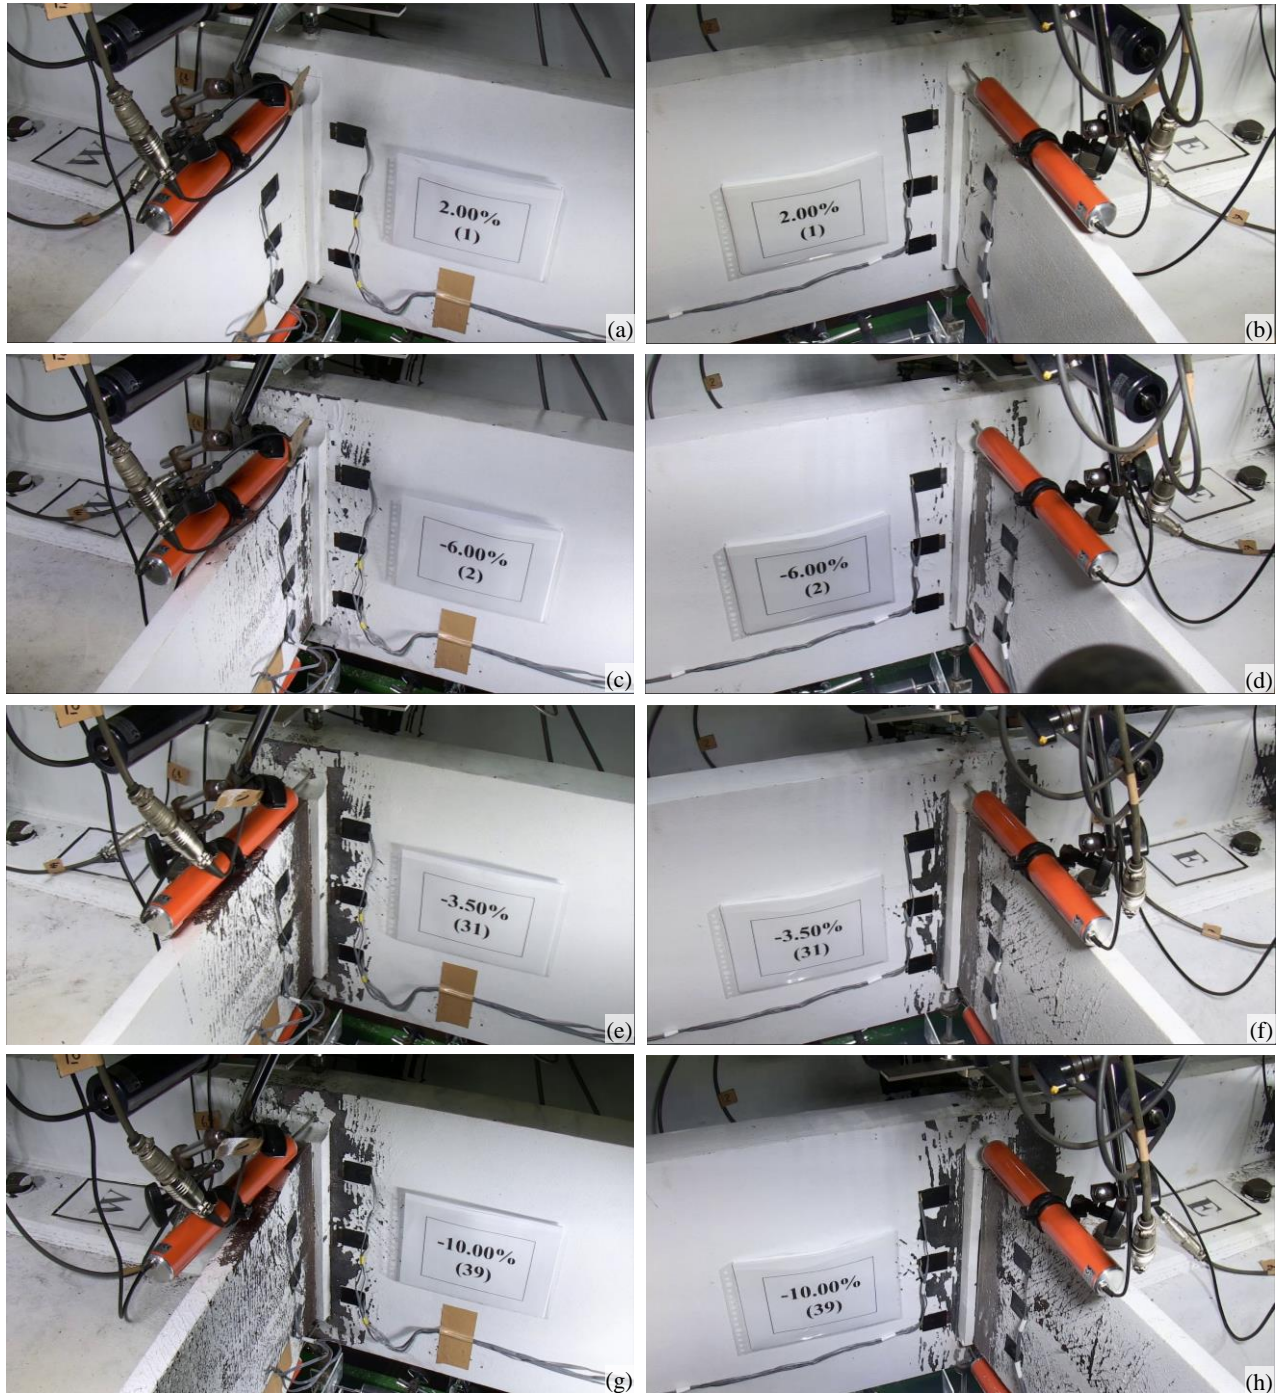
Specimen 2 bottom beam flanges at characteristic loading excursions (left: west beam, right: east beam).
